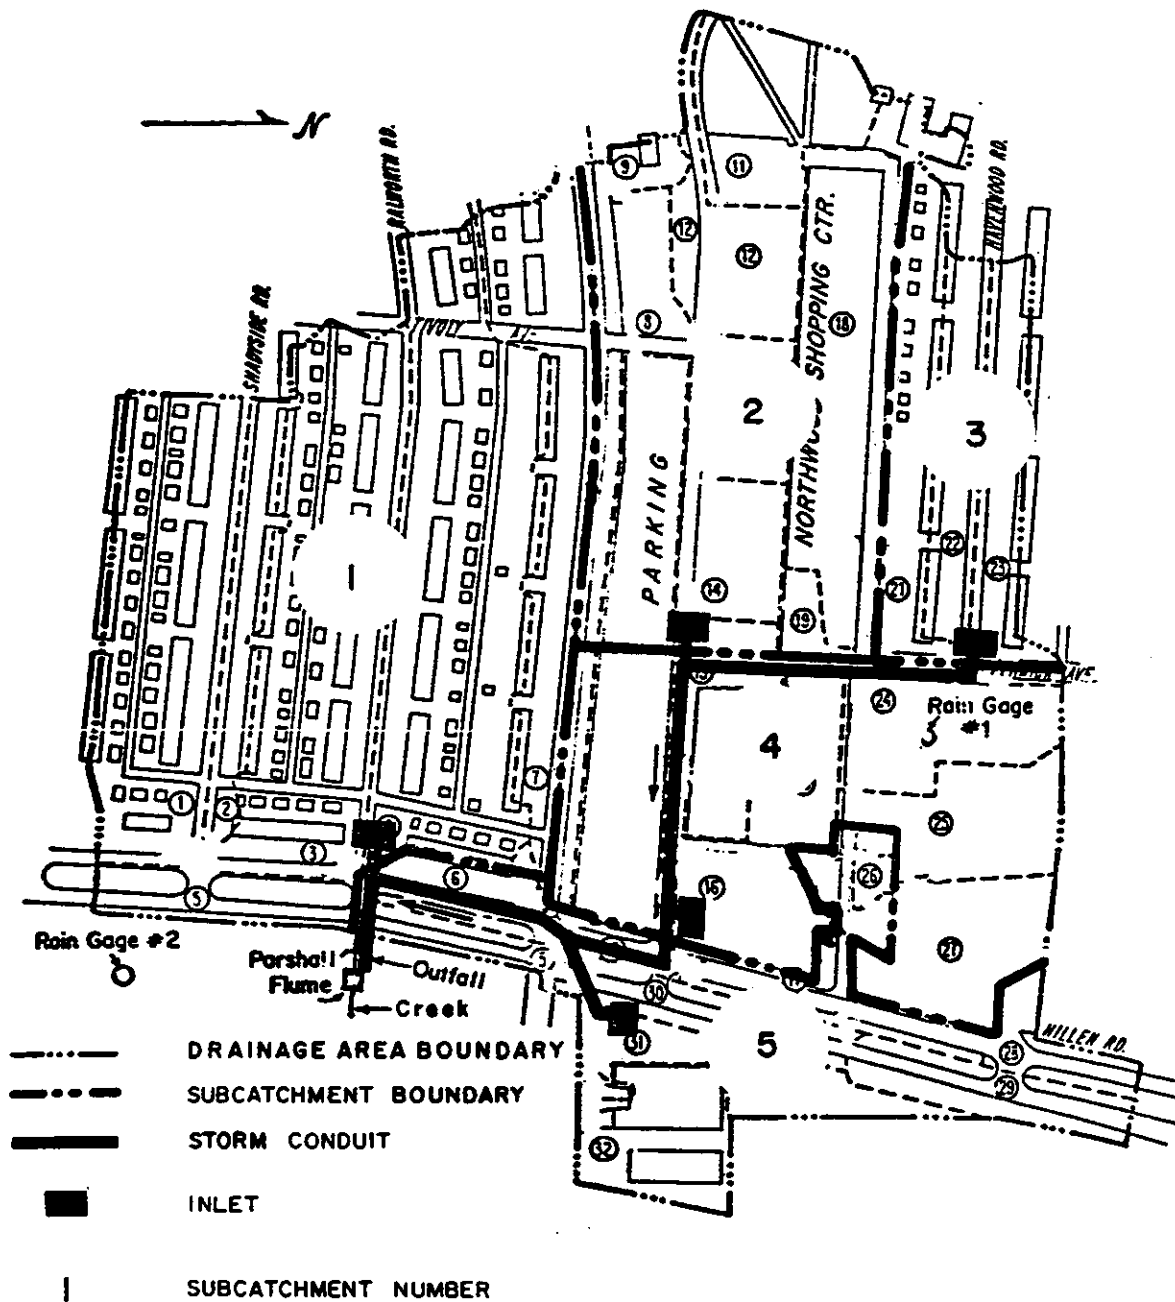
Northwood (Baltimore) Drainage Basin "Coarse" Plan.
